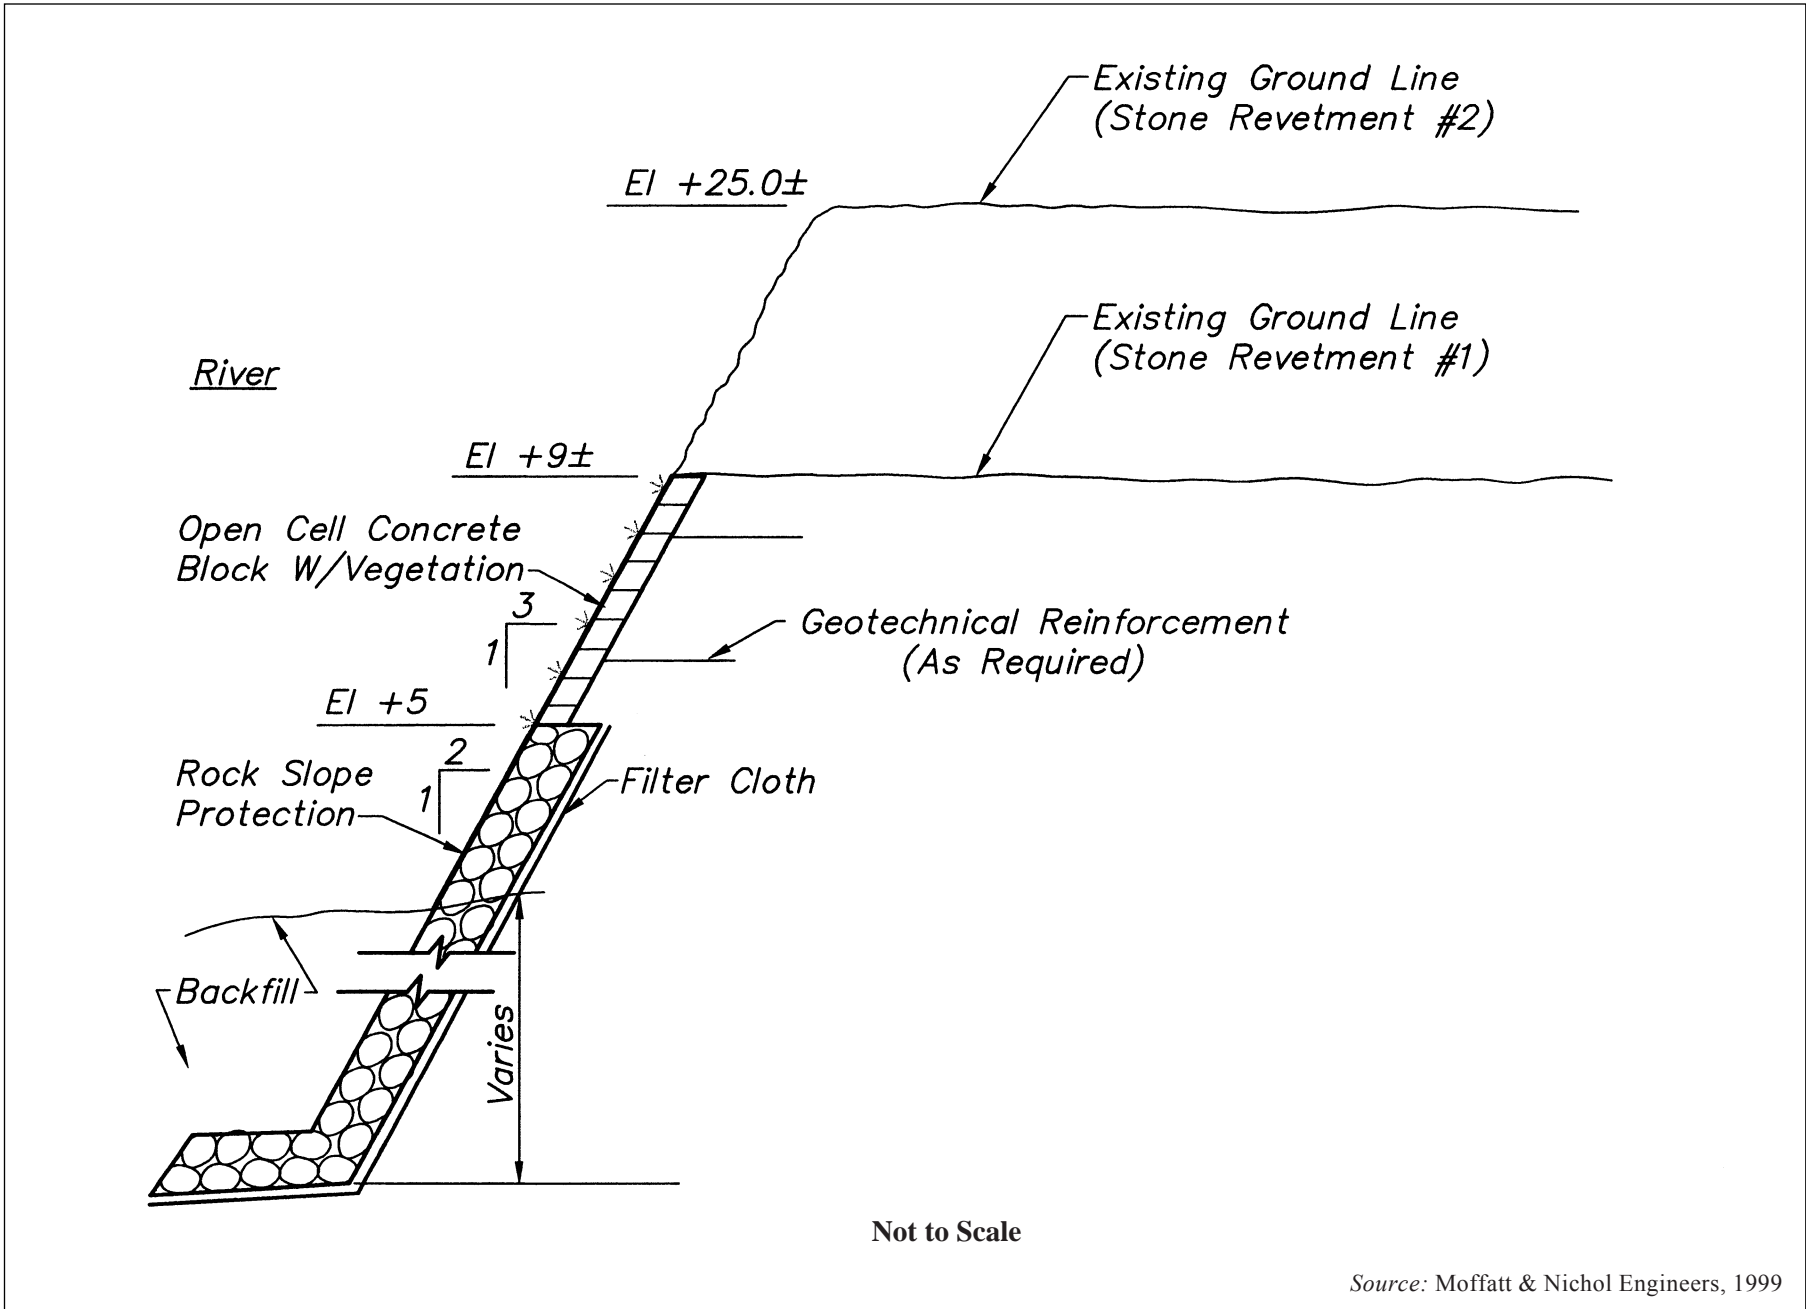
Typical Stone Revetment Sections #1 and #2
